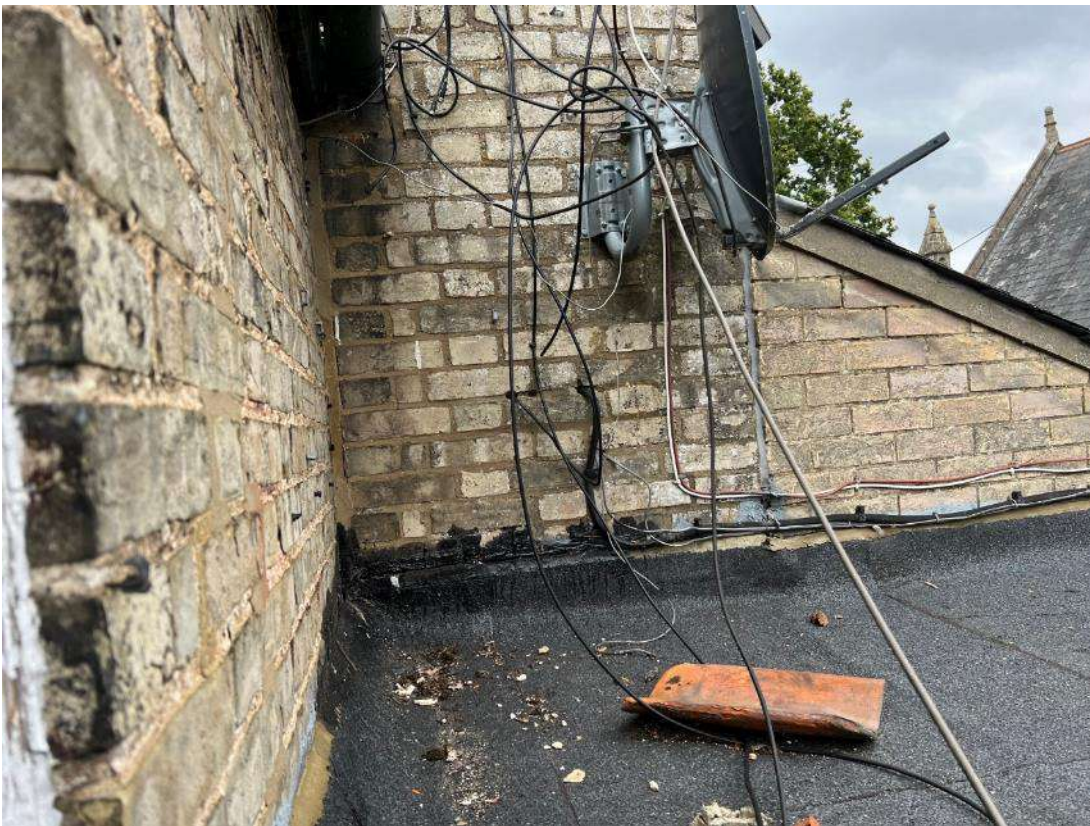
Building section 3 (ref B3B). Shows flat roof of section B3B adjoining eastern aspect of section B3A.
